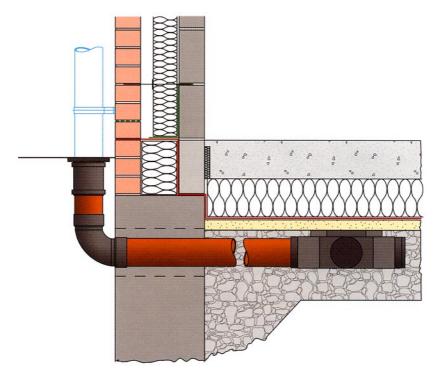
Detail at Junction of Ground Floor & External Masonry Wall
